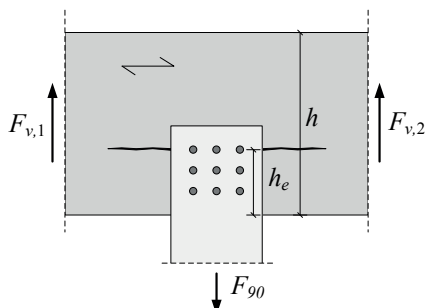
Typical crack pattern at a connection loaded perpendicular to grain.
